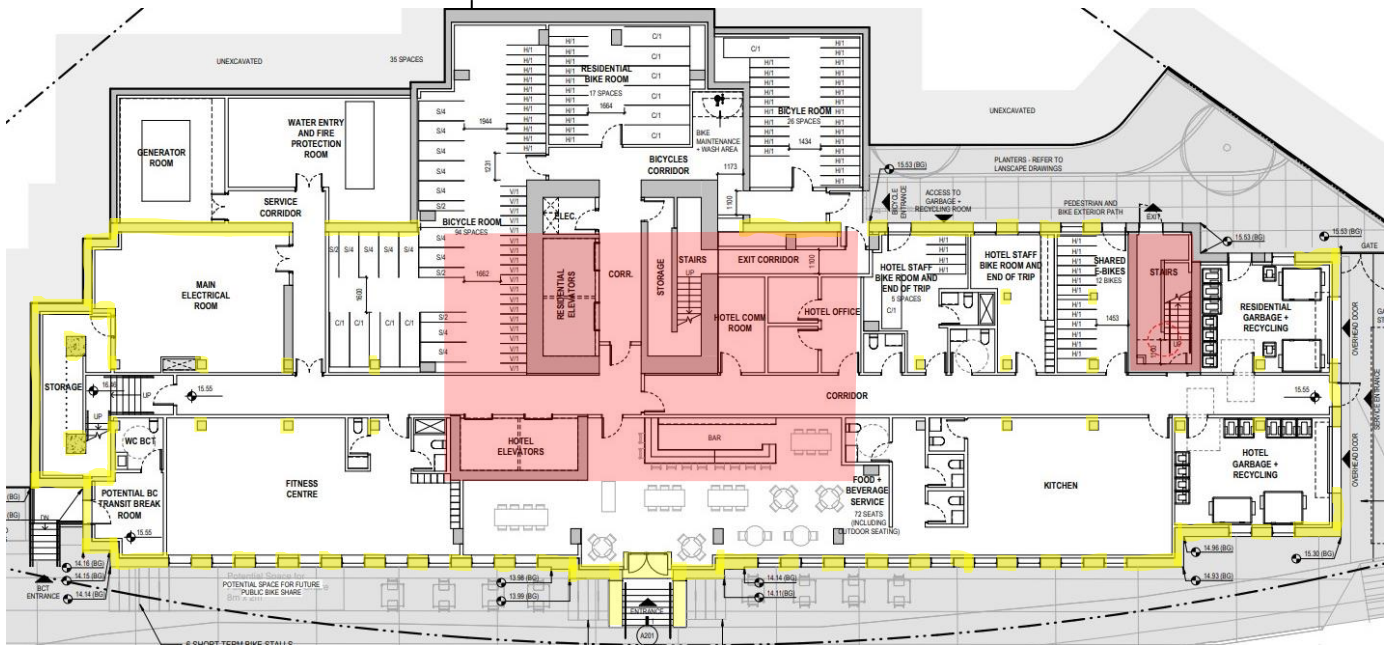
Proposed Level 1 Floor Plan. Retention of building and structure. The south entrance and closed stair retaining walls and surround will be restored to their original appearance with dark marble cladding. Source: omb Architects + Designers architectural drawings, February 17, 2023.
